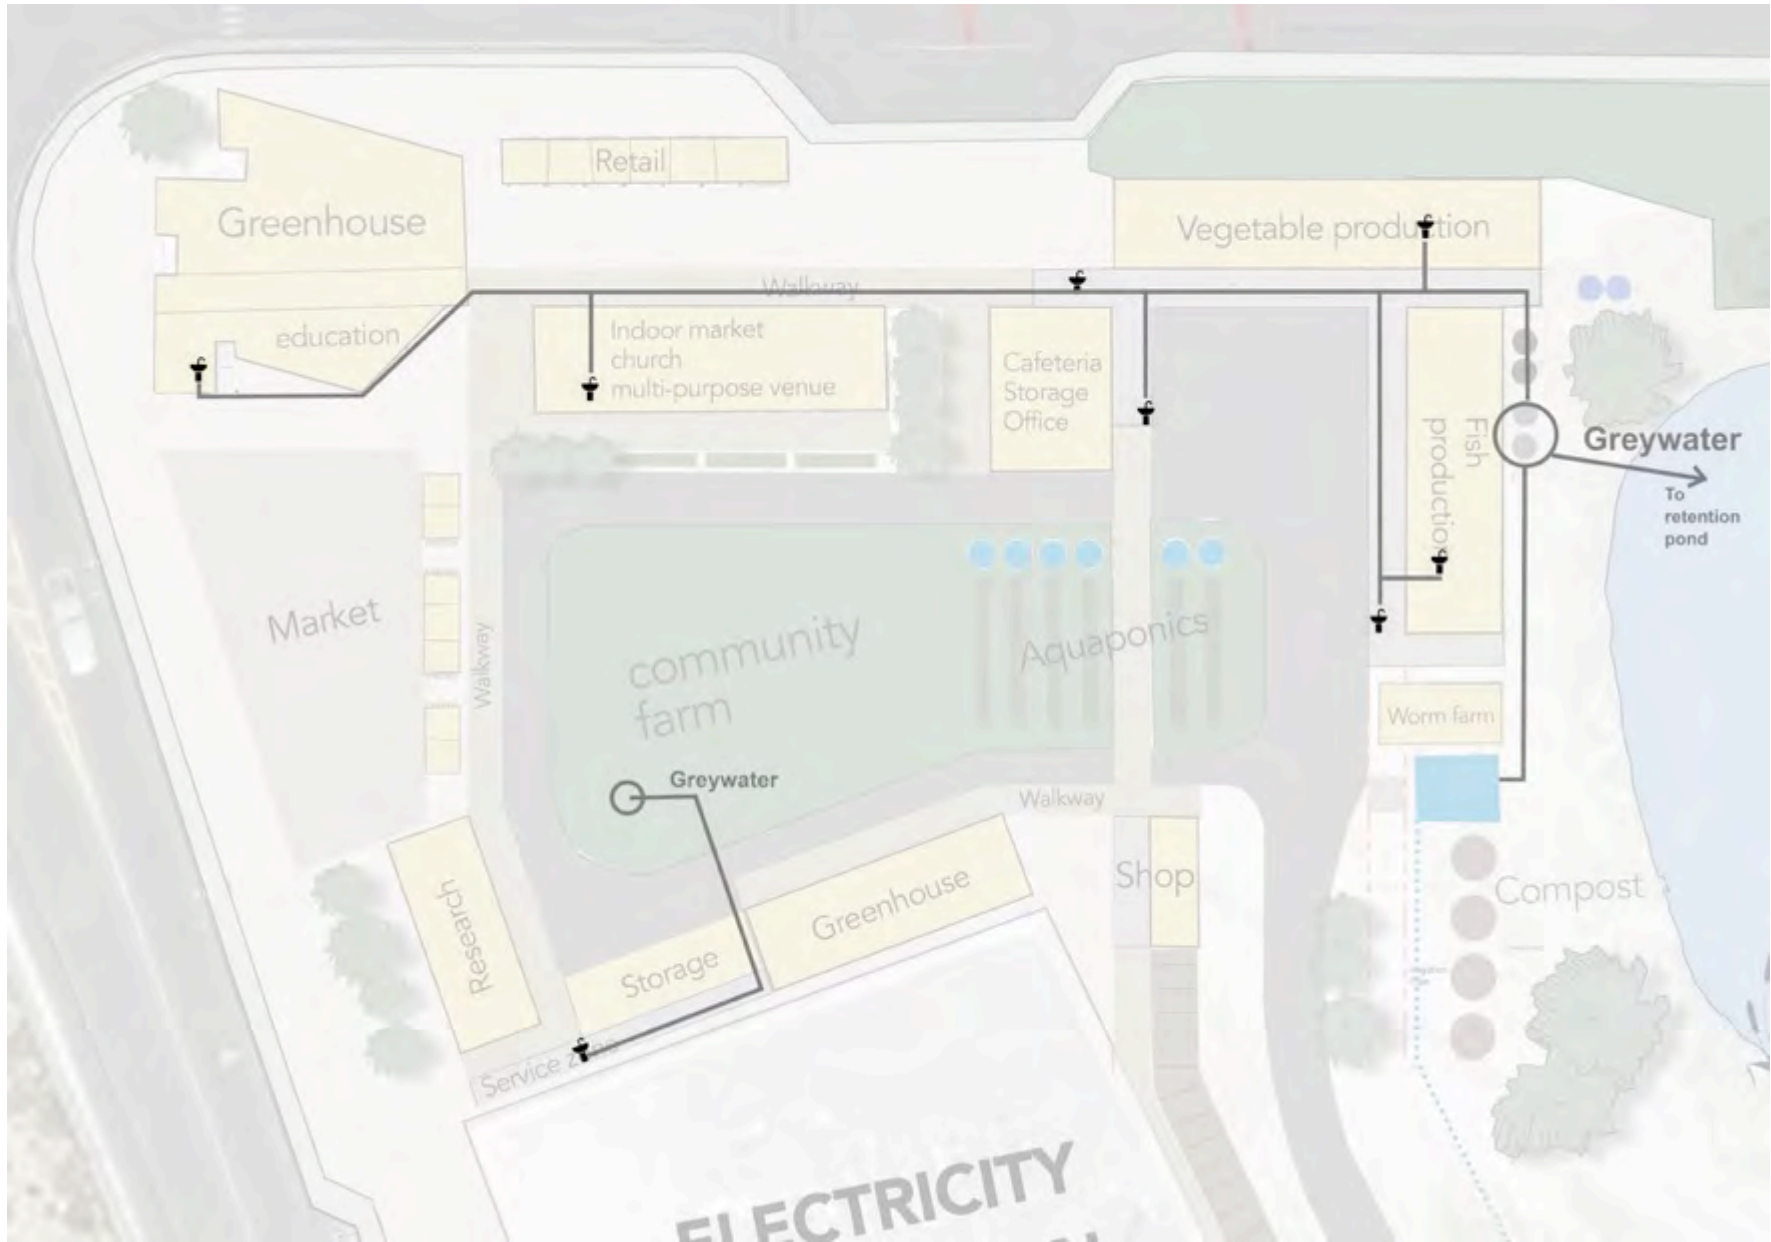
Greywater recycling. Note: Water will be used for irrigation when rainwater is scarce and excess greywater will be pumped into the retention pond.
